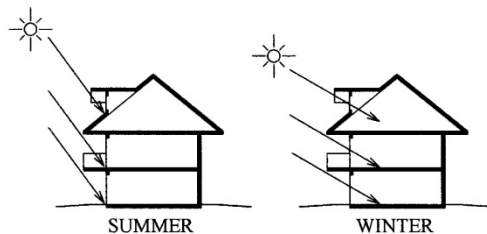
Passive protection of the building from excessive sunlight (Source: Author's drawing of December 2012)
